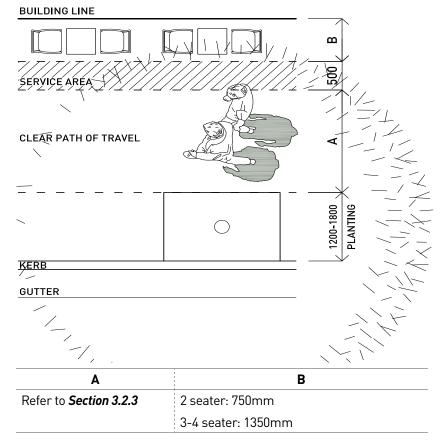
Outdoor Dining Layout Diagram - Buildingside
